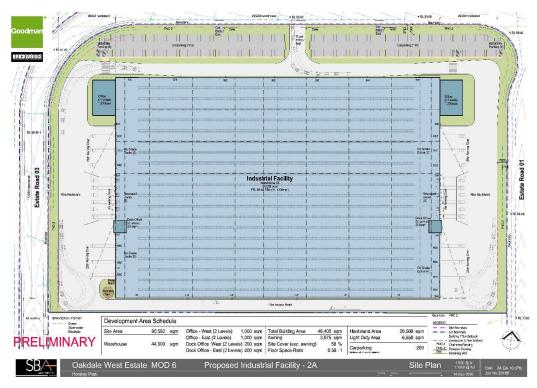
Proposed layout Warehouse 2A (Source: Goodman)
